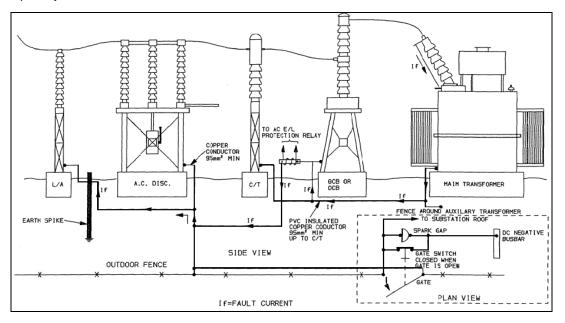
Typical layout of the earthing of the equipment in the outdoor yard
